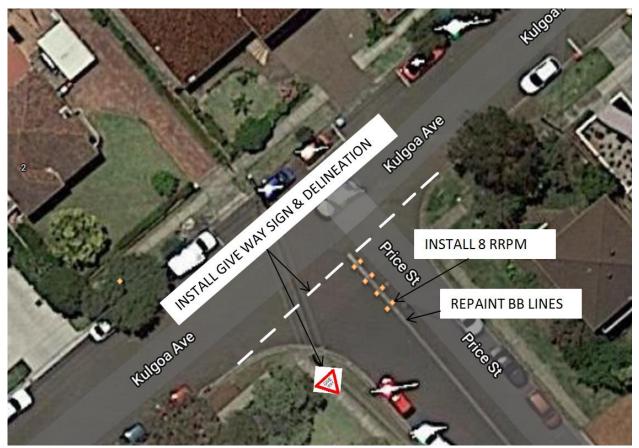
Proposed Changes on Price Street at Kulgoa Avenue.
